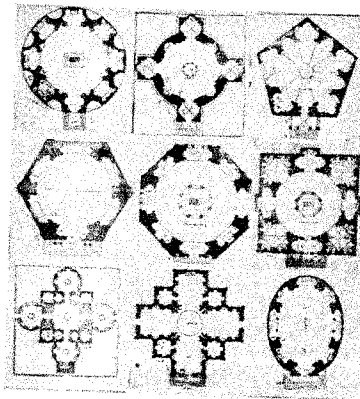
Serlio, drawings of buildings with centralized plan scheme
